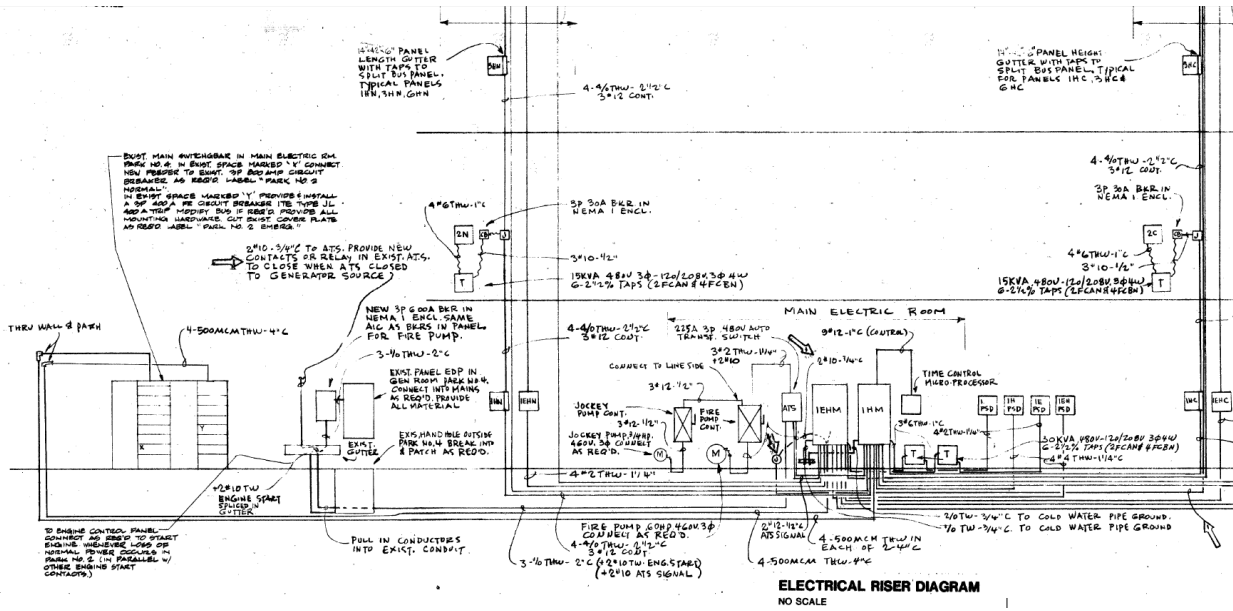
Electrical riser diagram of switchgear room (from the 80's). This should be used for overall context, not existing conditions.
